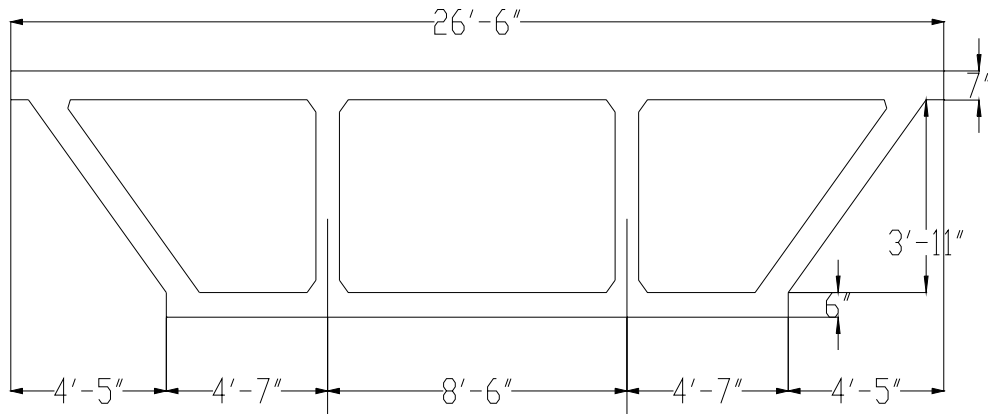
Cross Section of 1RWD Off-Ramp Bridge Deck (reinforcement not shown, drawing not to scale)
